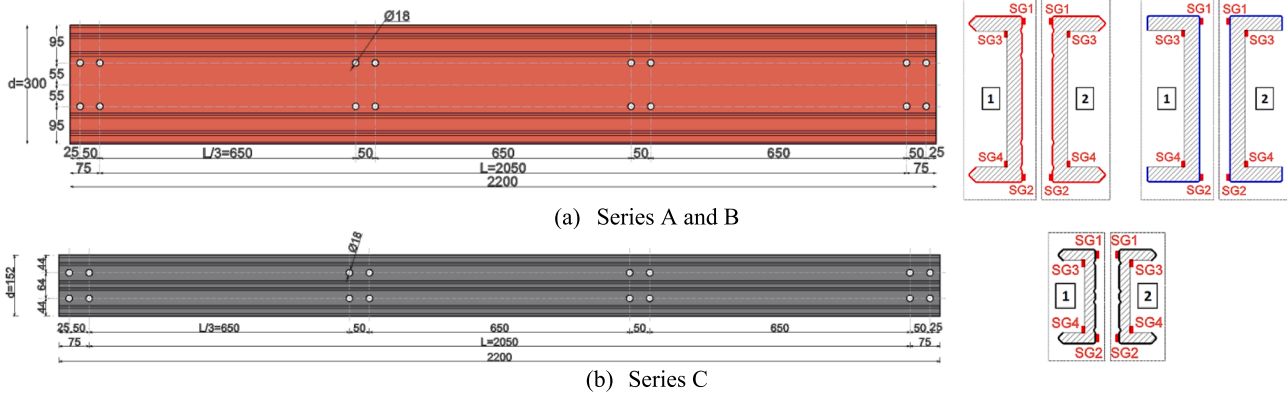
Dimensions, bolts arrangements and strain gauge locations.
